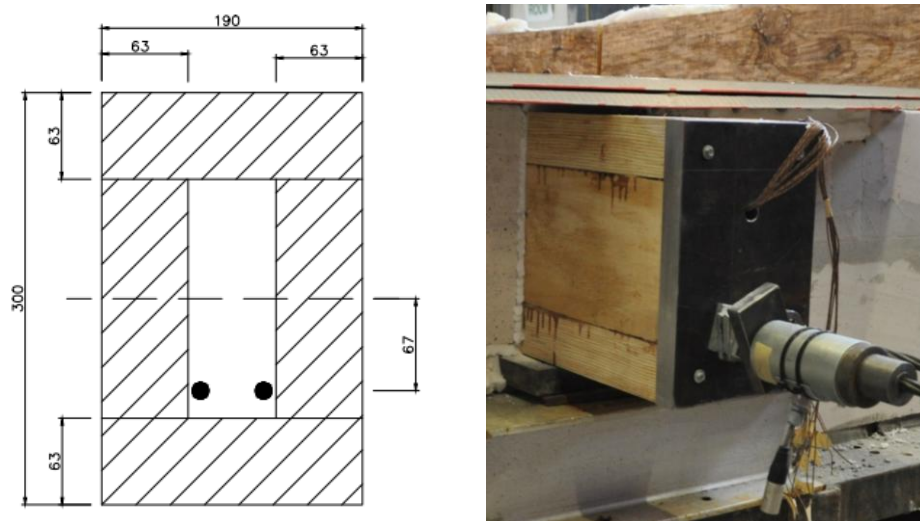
Beam C - LVL cross-section (left). Photo of completed beam showing post-tensioning anchorage (right)
